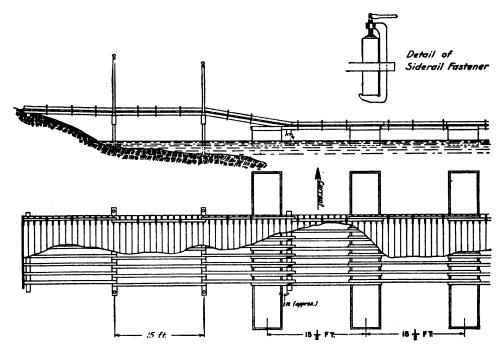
Elevation and plan of typical shore connection, using two trestle spans.
